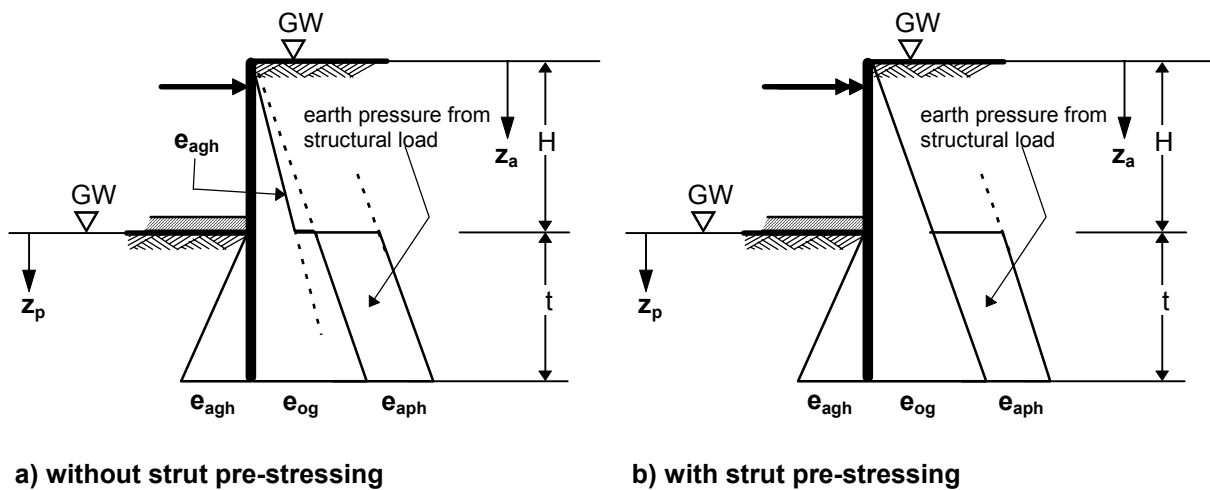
Possible load diagram for a rigid wall supported by a strut at the top and by a bottom slab installed by means of jet pile column or soilcrete
